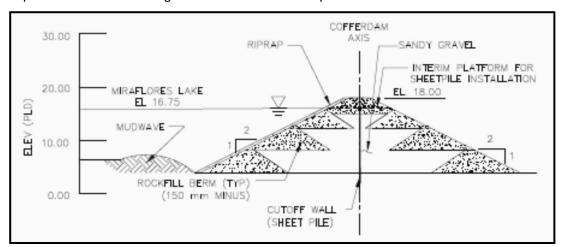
Typical Section of the Embankment cofferdam with sheet pile cutoff
